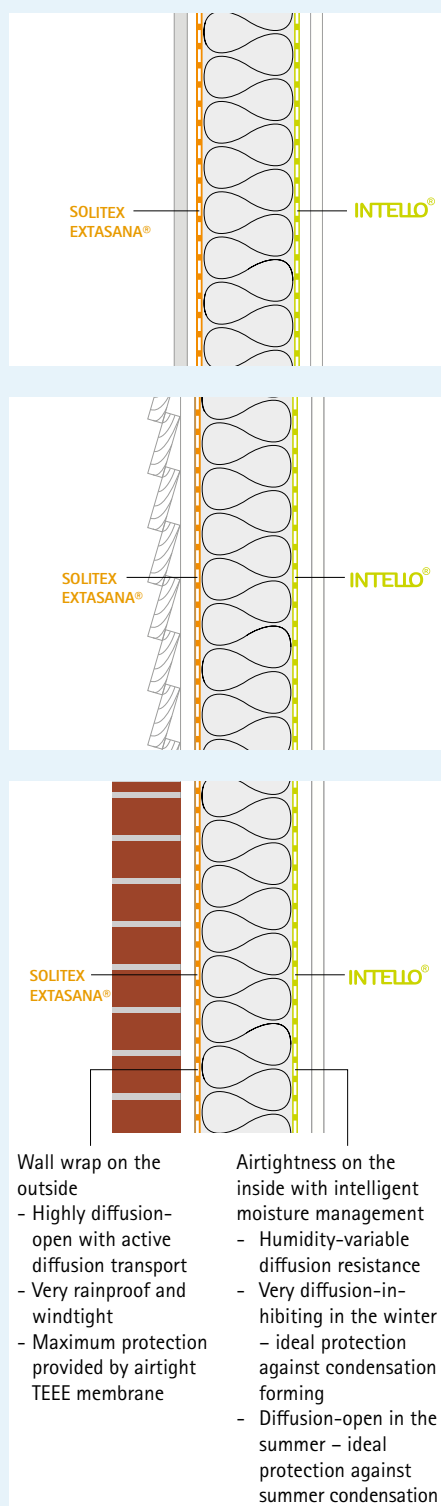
A well protected lightweight wall or brick veneer construction in climate zone 2–8
